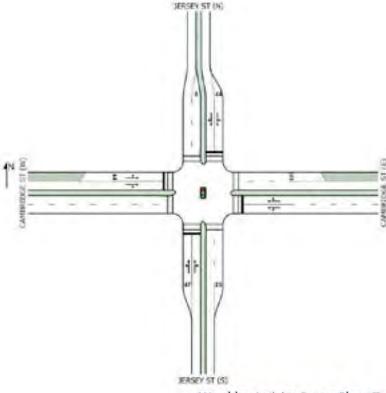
Cambridge Street /Jersey Street - Existing Intersection Layout PM Peak
